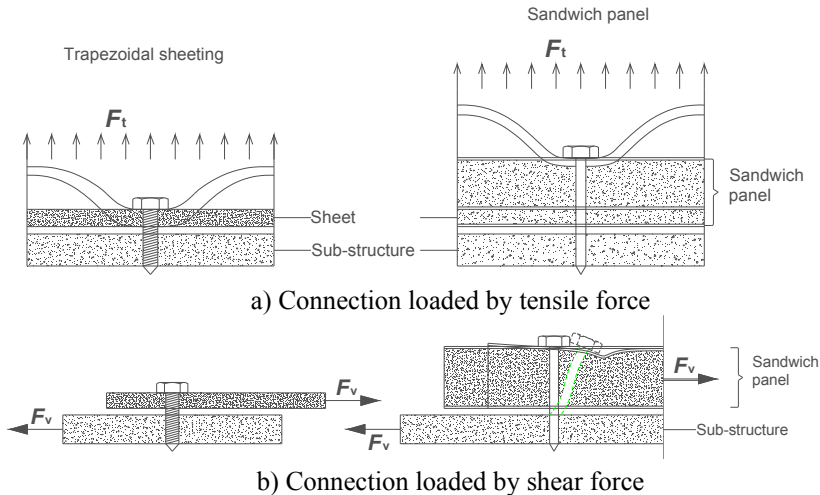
Local deformations of screw connections in trapezoidal sheeting and sandwich panels when loaded by a) tensile and b) shear forces (Davies, 2001)
